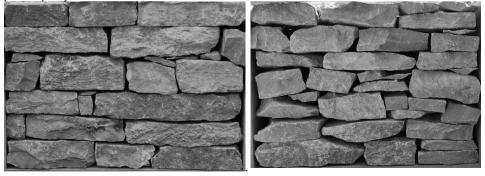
Sample wall blocks: a) best practice; b) poor construction
